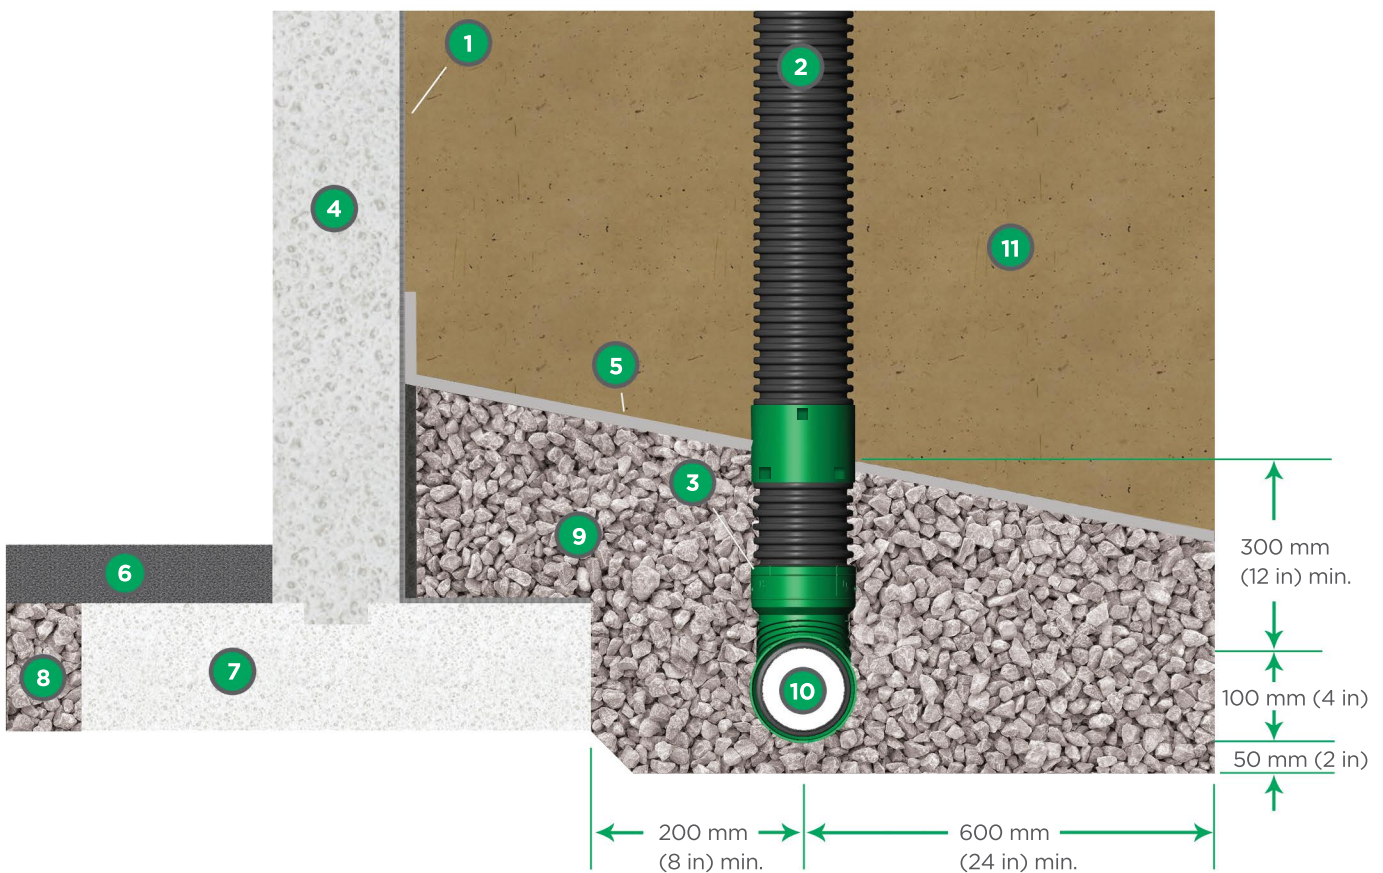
DETAILED INSTALLATION OF A DRAINAGE ACCESS SYSTEM WITHOUT IRON OCHRE.
